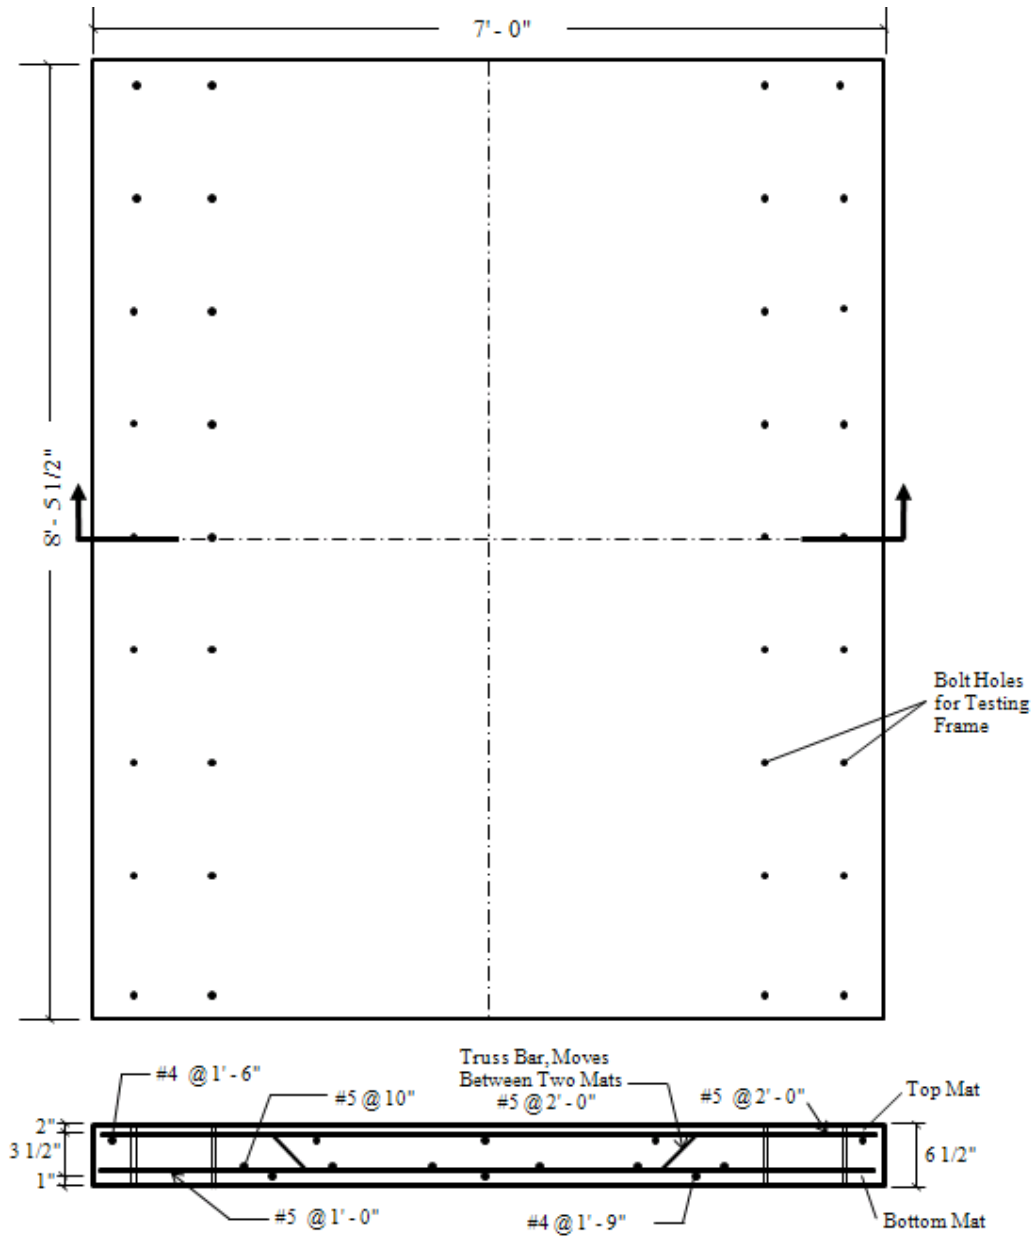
Dimensions and Reinforcement Details of Test Specimen
